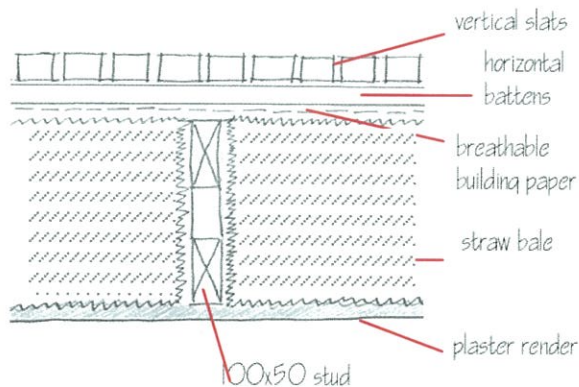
Rainscreen cladding of vertical timber slats (slats to have 5-10mm gap between each)
